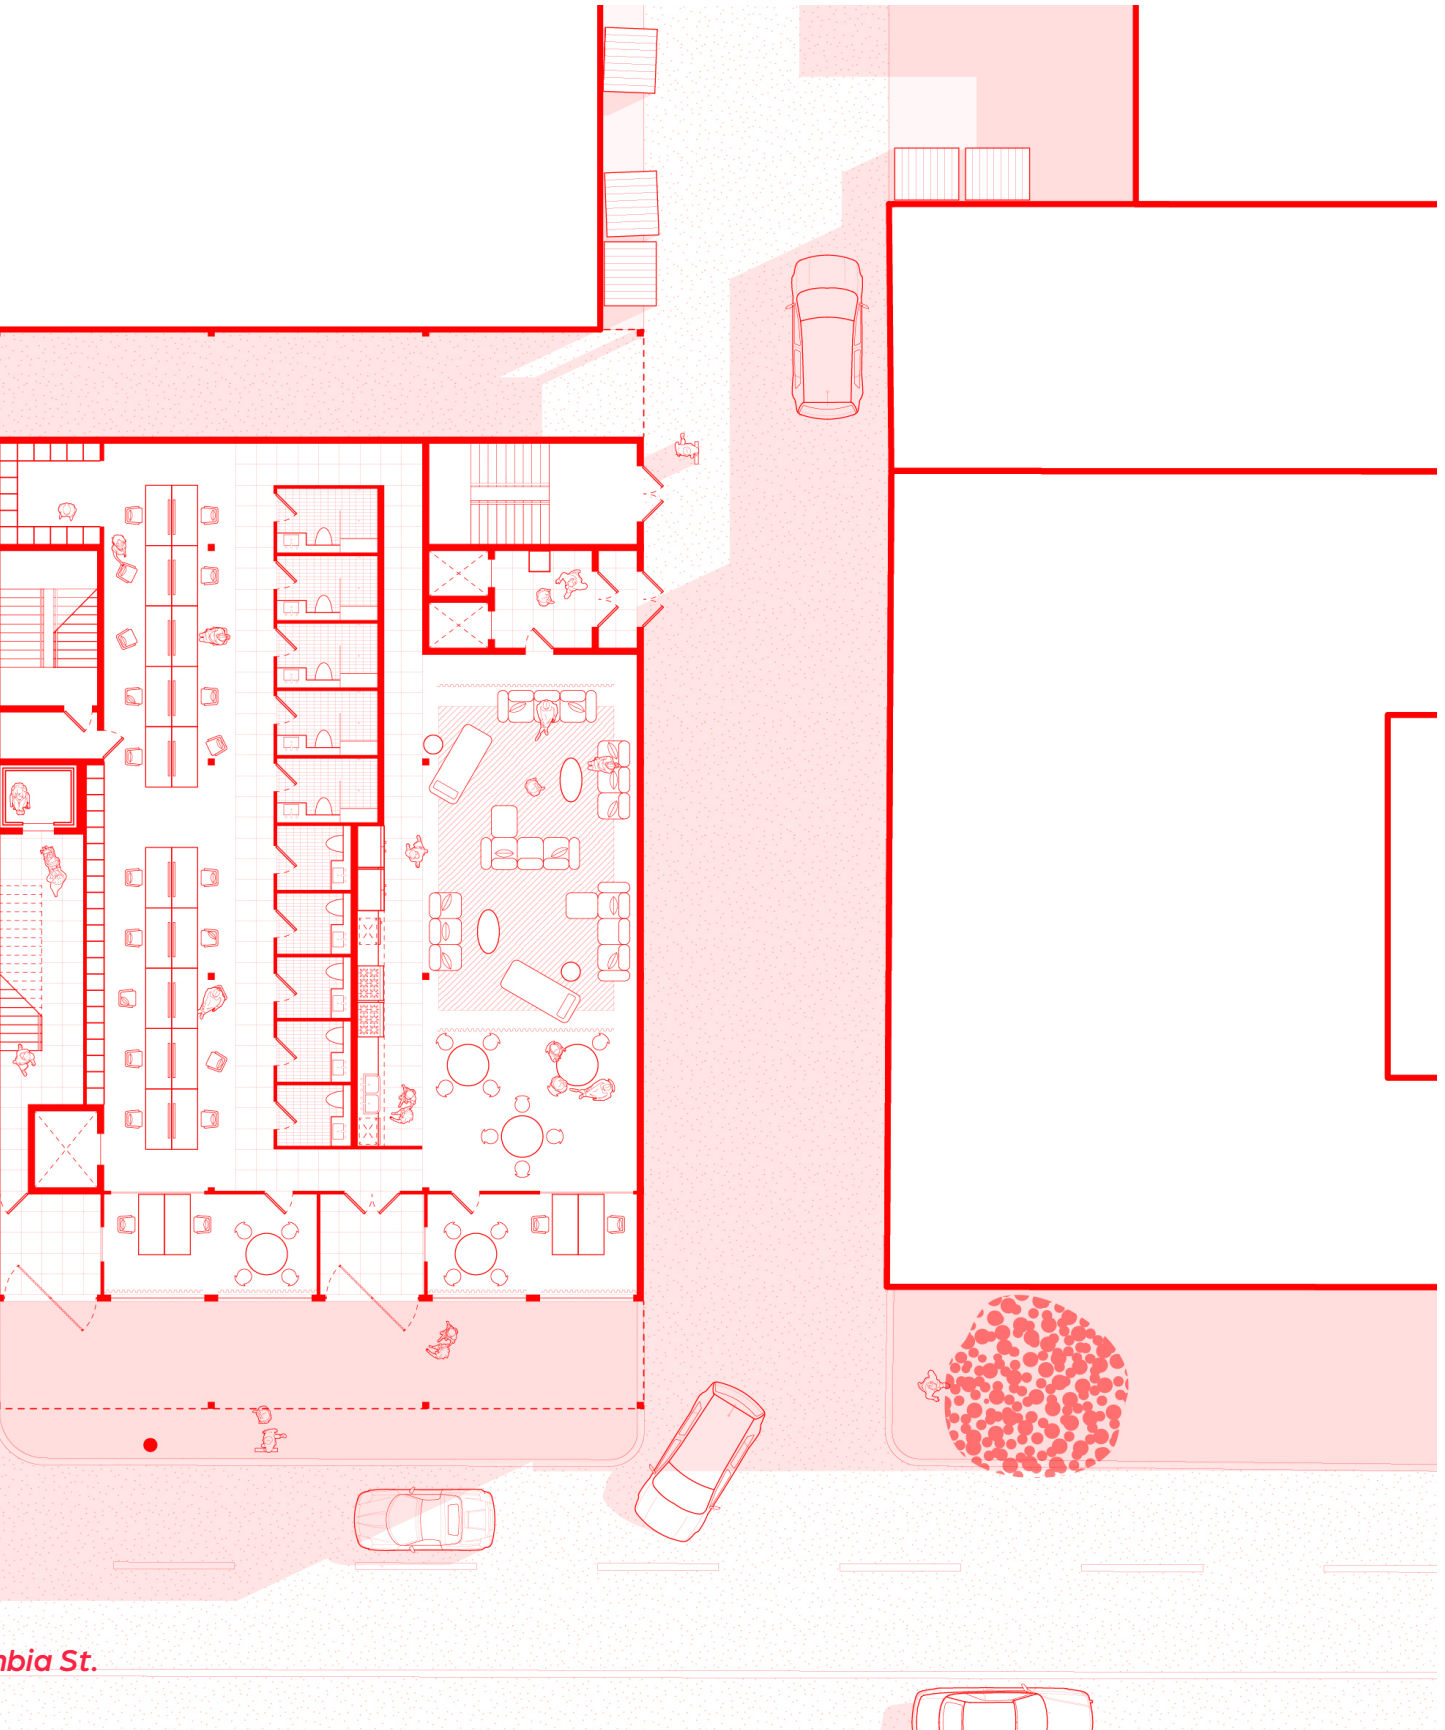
Downtown Eastside Site - Ground Floor Plan
